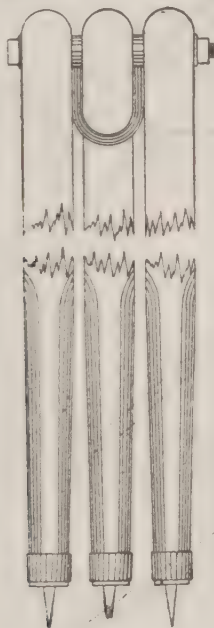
,211.—Tripod or shear legs. *In construction*, a hole for a good stout bolt is bored through all three legs; a U-shaped piece of iron called a shackle is placed in position as shown in the drawing and the bolt is run through to hold all together. The bolt should be left rather loose and after it is in place the threaded end should be riveted slightly to avoid the possibility of the nut coming off.
